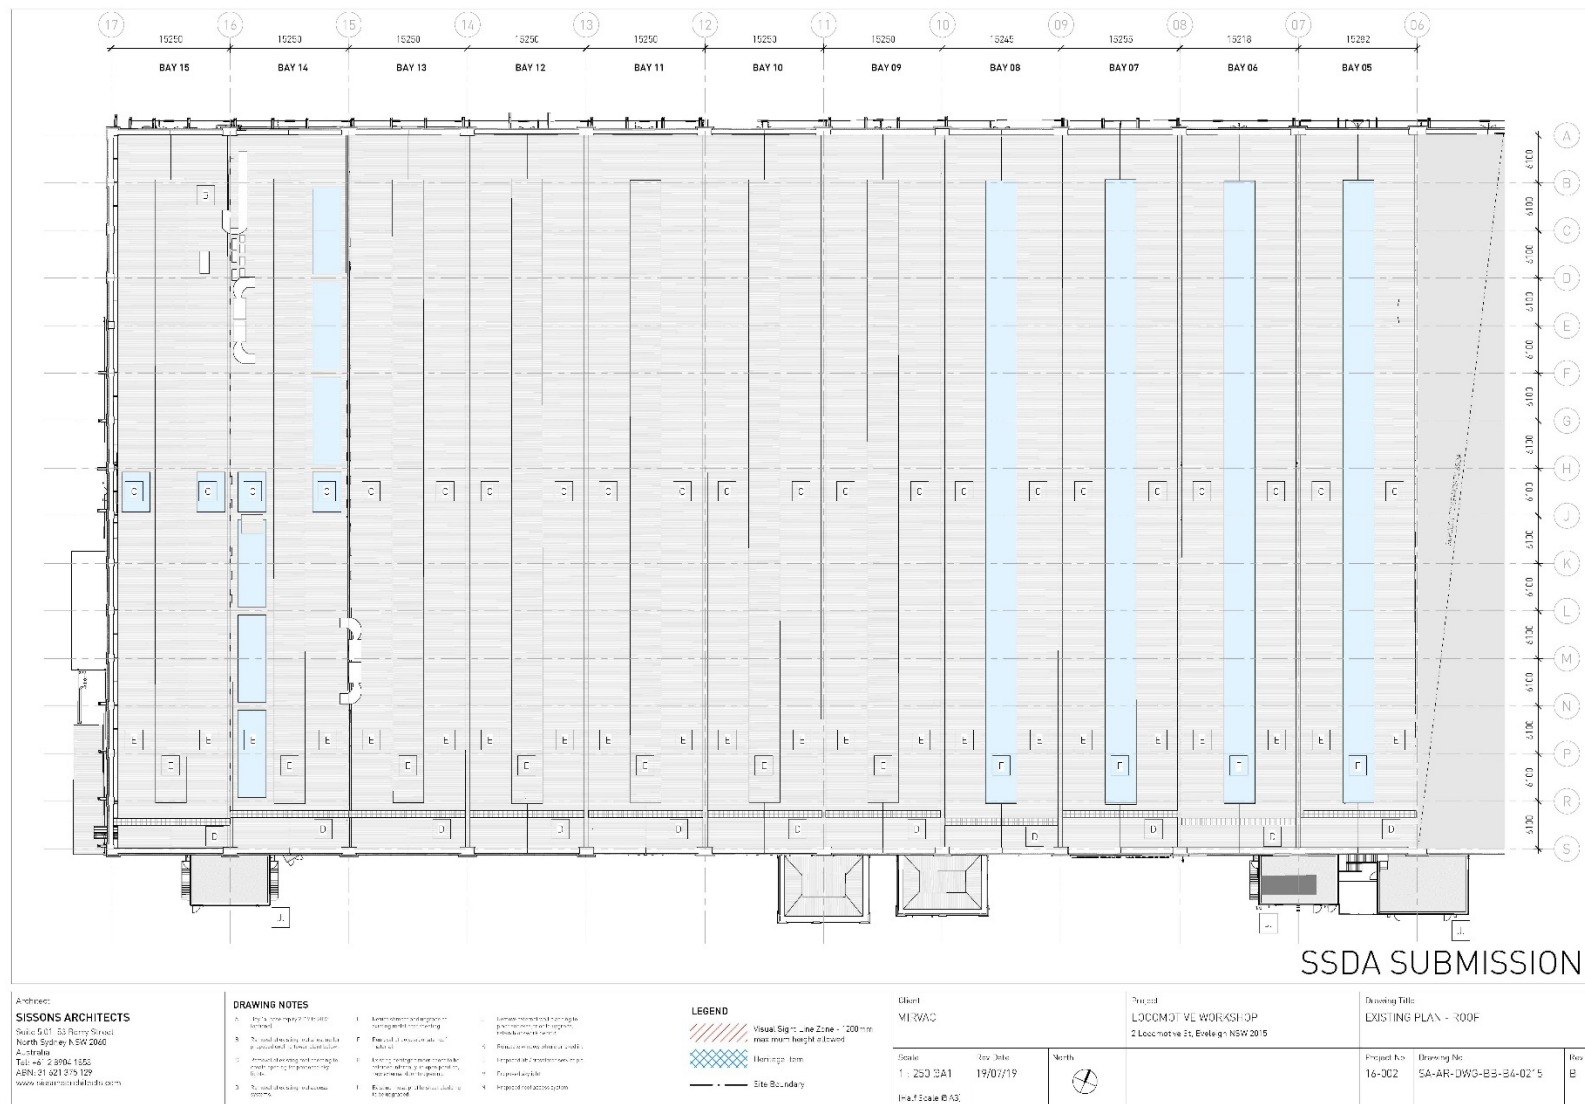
Previous Fitout and Existing Roof Plan (Source: Sissons 2017)
